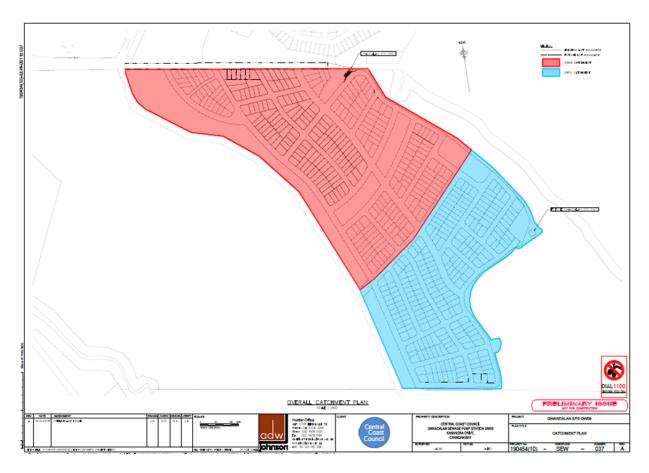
Gwandalan Development Lot Layout Plan (GW09 Catchment = Red; GW10 =Blue)
